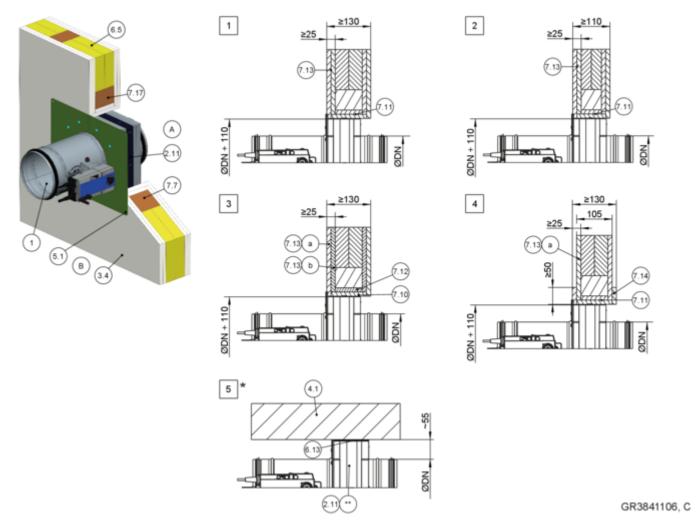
Dry mortarless installation into a lightweight partition wall with timber support structure, with installation kit TQ2
